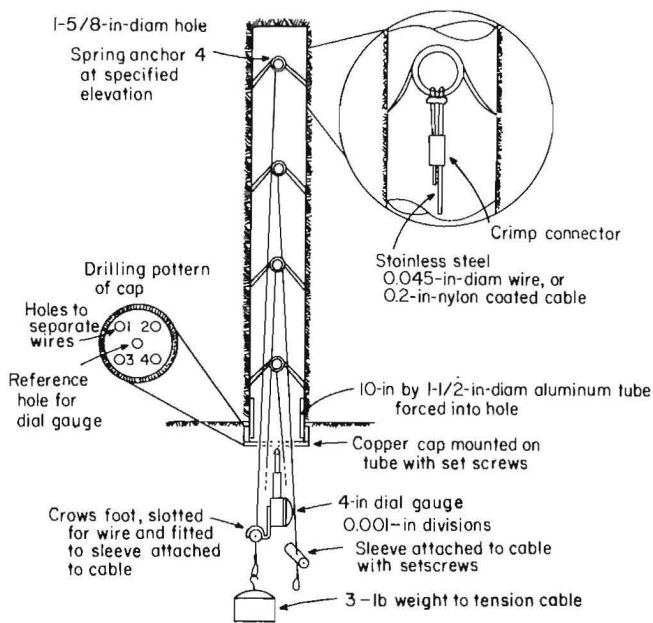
Roof extensometer installation detail—MSHA-style differential sag indicator.
